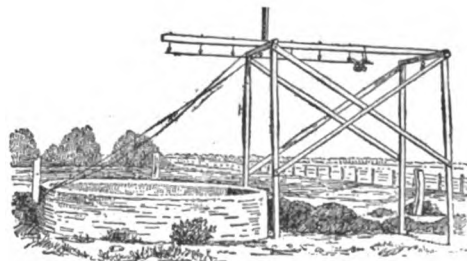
Nebraska pit silo showing hay loader and track used for removing silage
